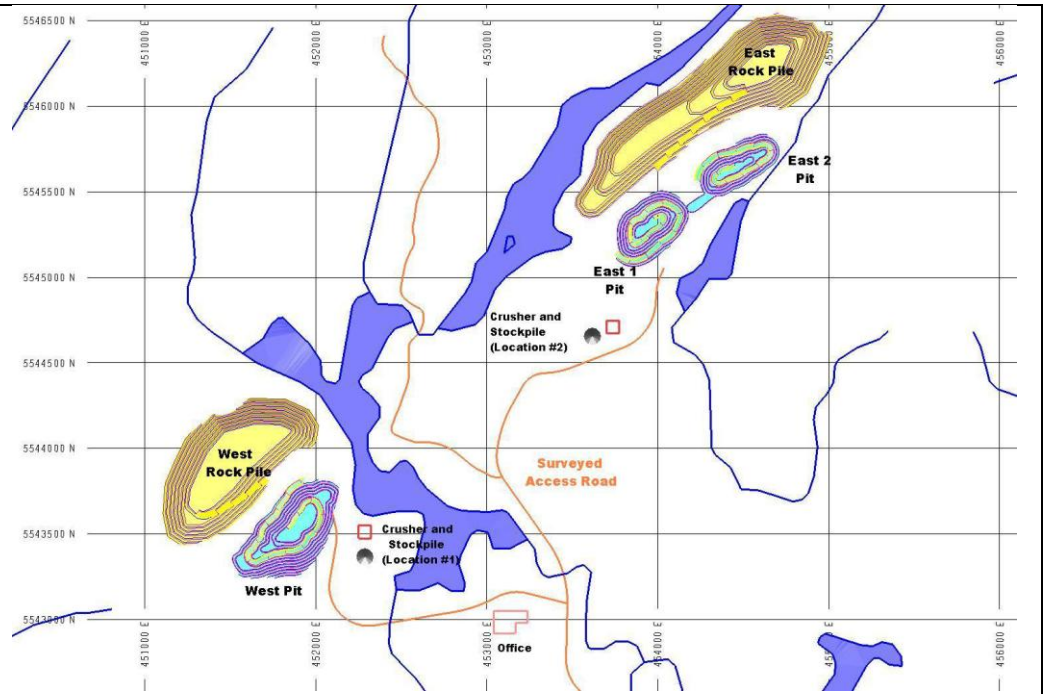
Hervieux East and West Mine Pit Design - Plan View
